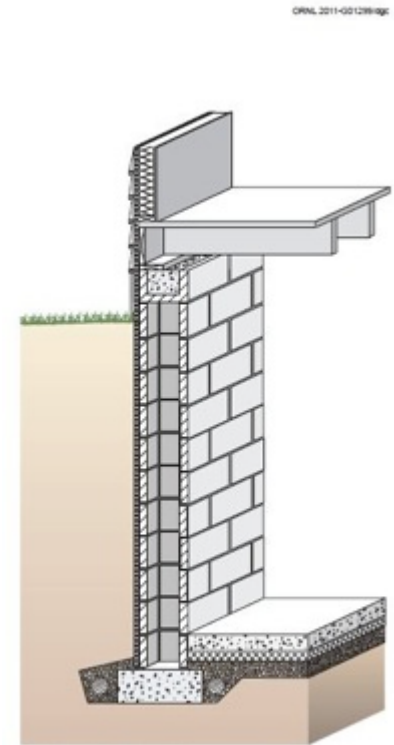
Concrete Masonry Basement Wall with Exterior Insulation
